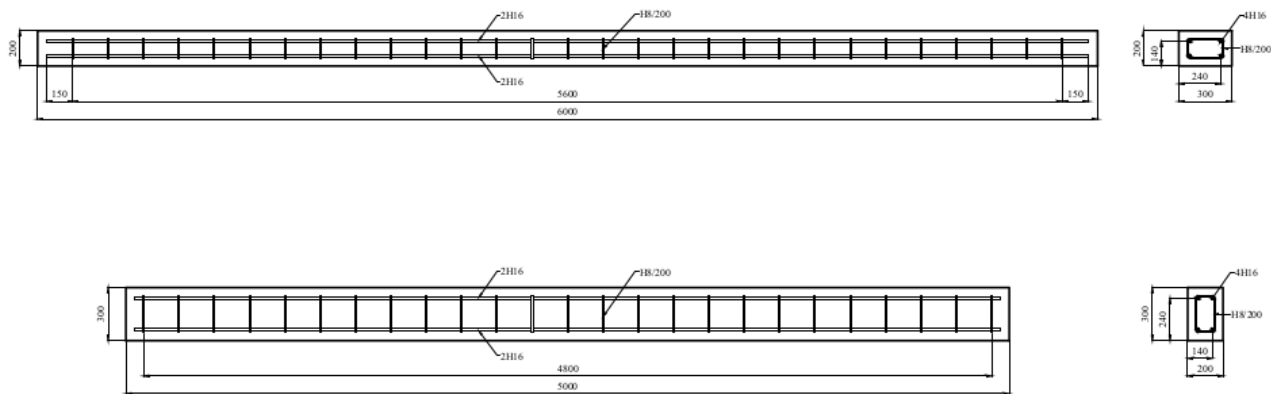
Geometry and reinforcement details of beams SS1 (top) and SS2 (bottom).
